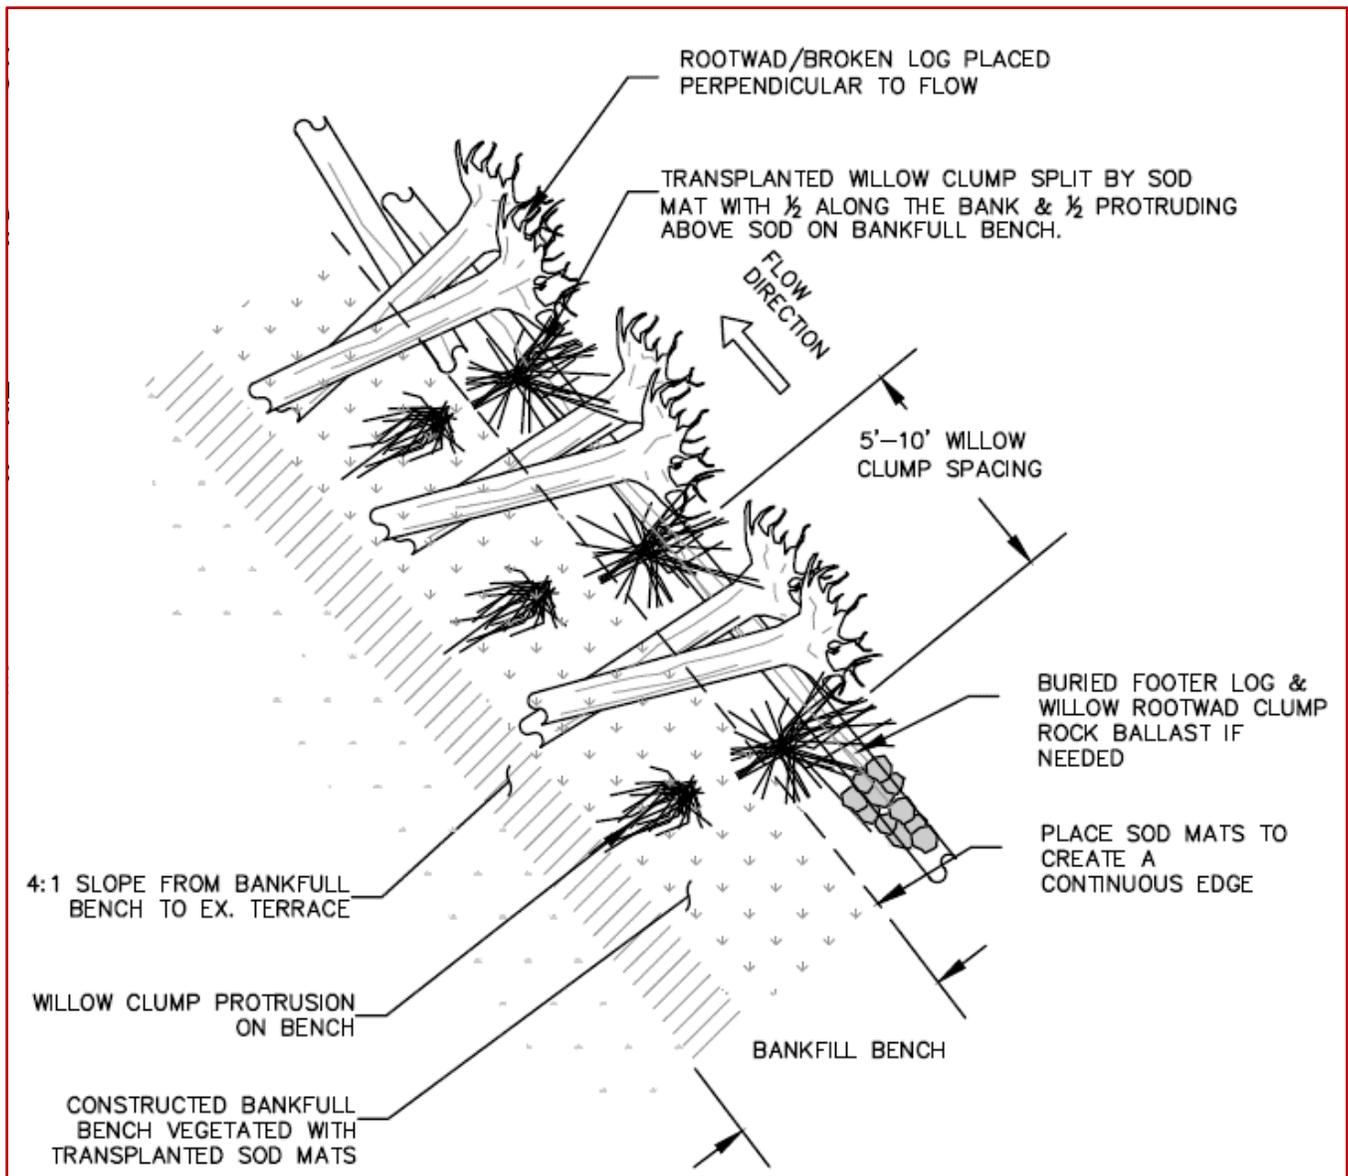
Plan view of typical wood revetment bank stabilization treatment.
